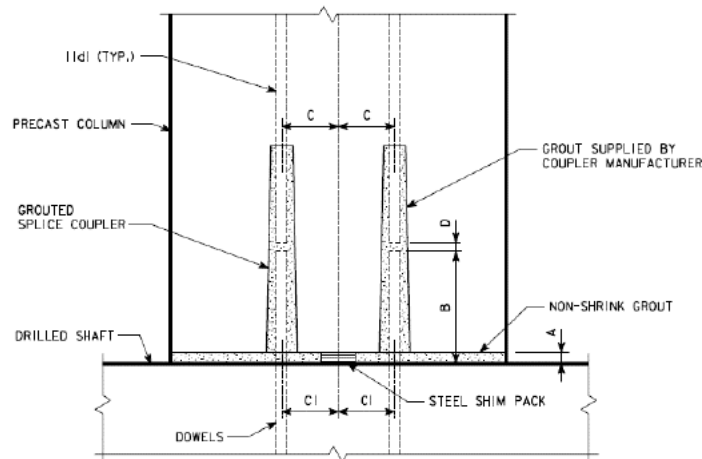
Precast column-to-footing connection in Keg Creek Bridge (Littleton 2013)
